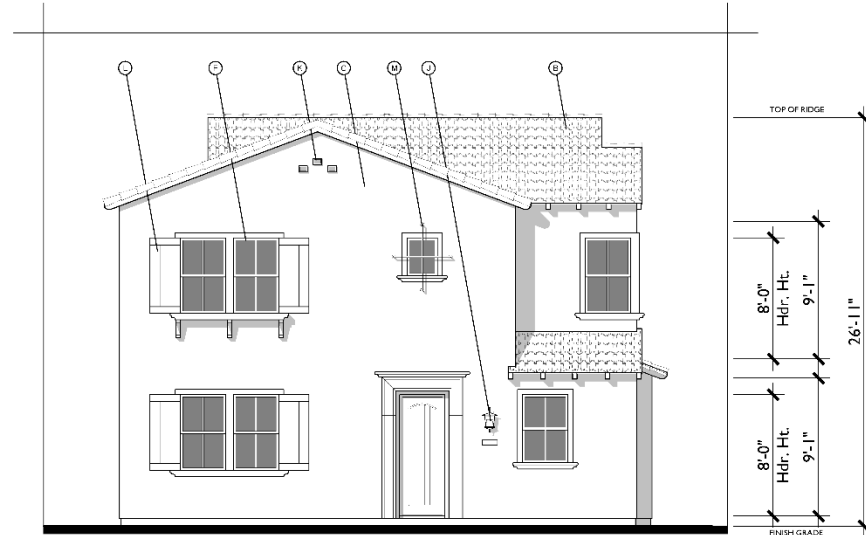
Spanish Colonial Elevation - Cluster Plan 3
